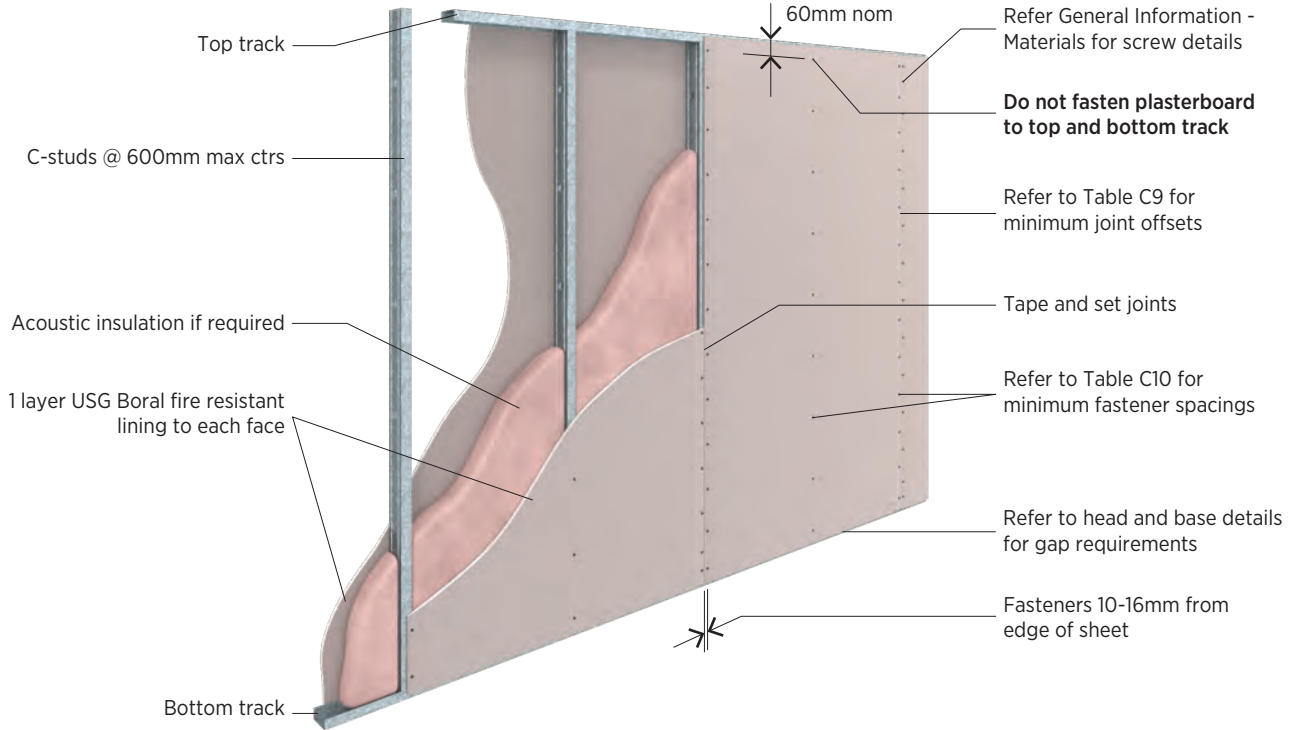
Non-Fire Rated Steel Stud – Vertical Fixing – Single Layer (fully screw fixed)
